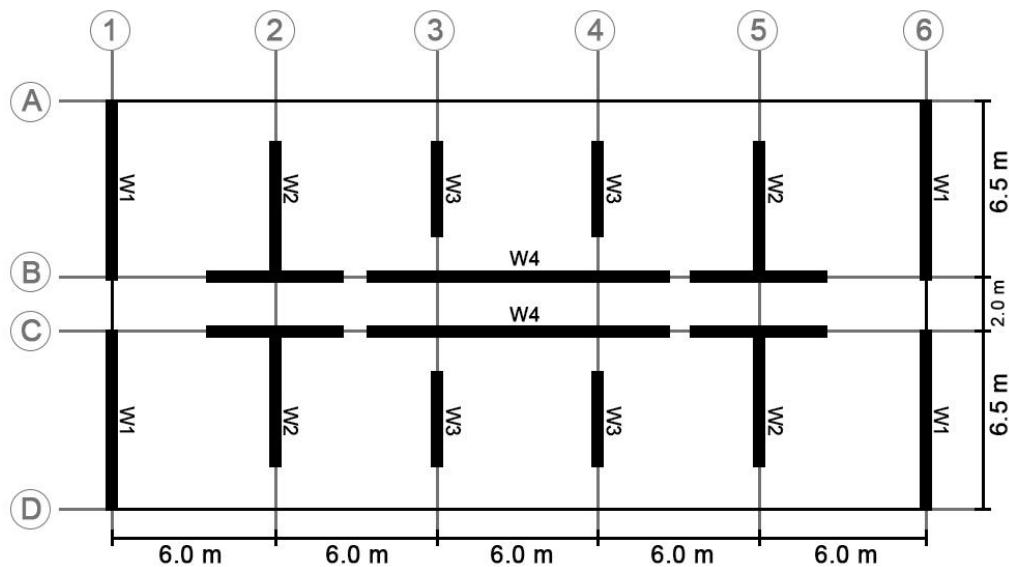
Plan view of the study building, after Cando *et al.*(2020).
